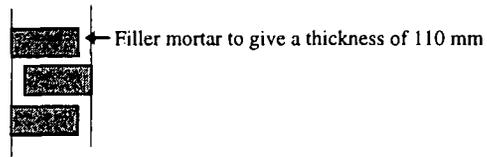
Bond arrangement for 110 mm thick brick walls
